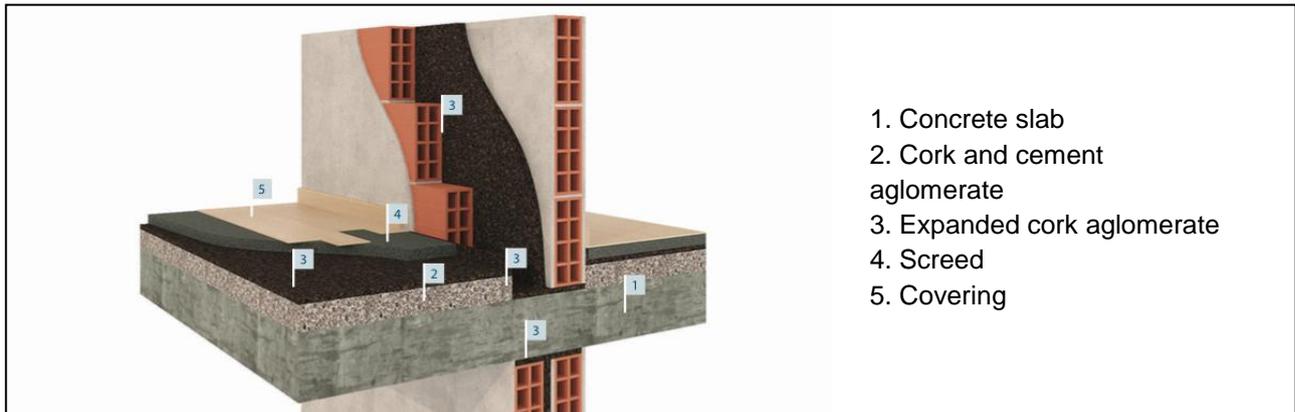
Acoustic insulation in floors and interior walls (Sofalca, n.d.).
